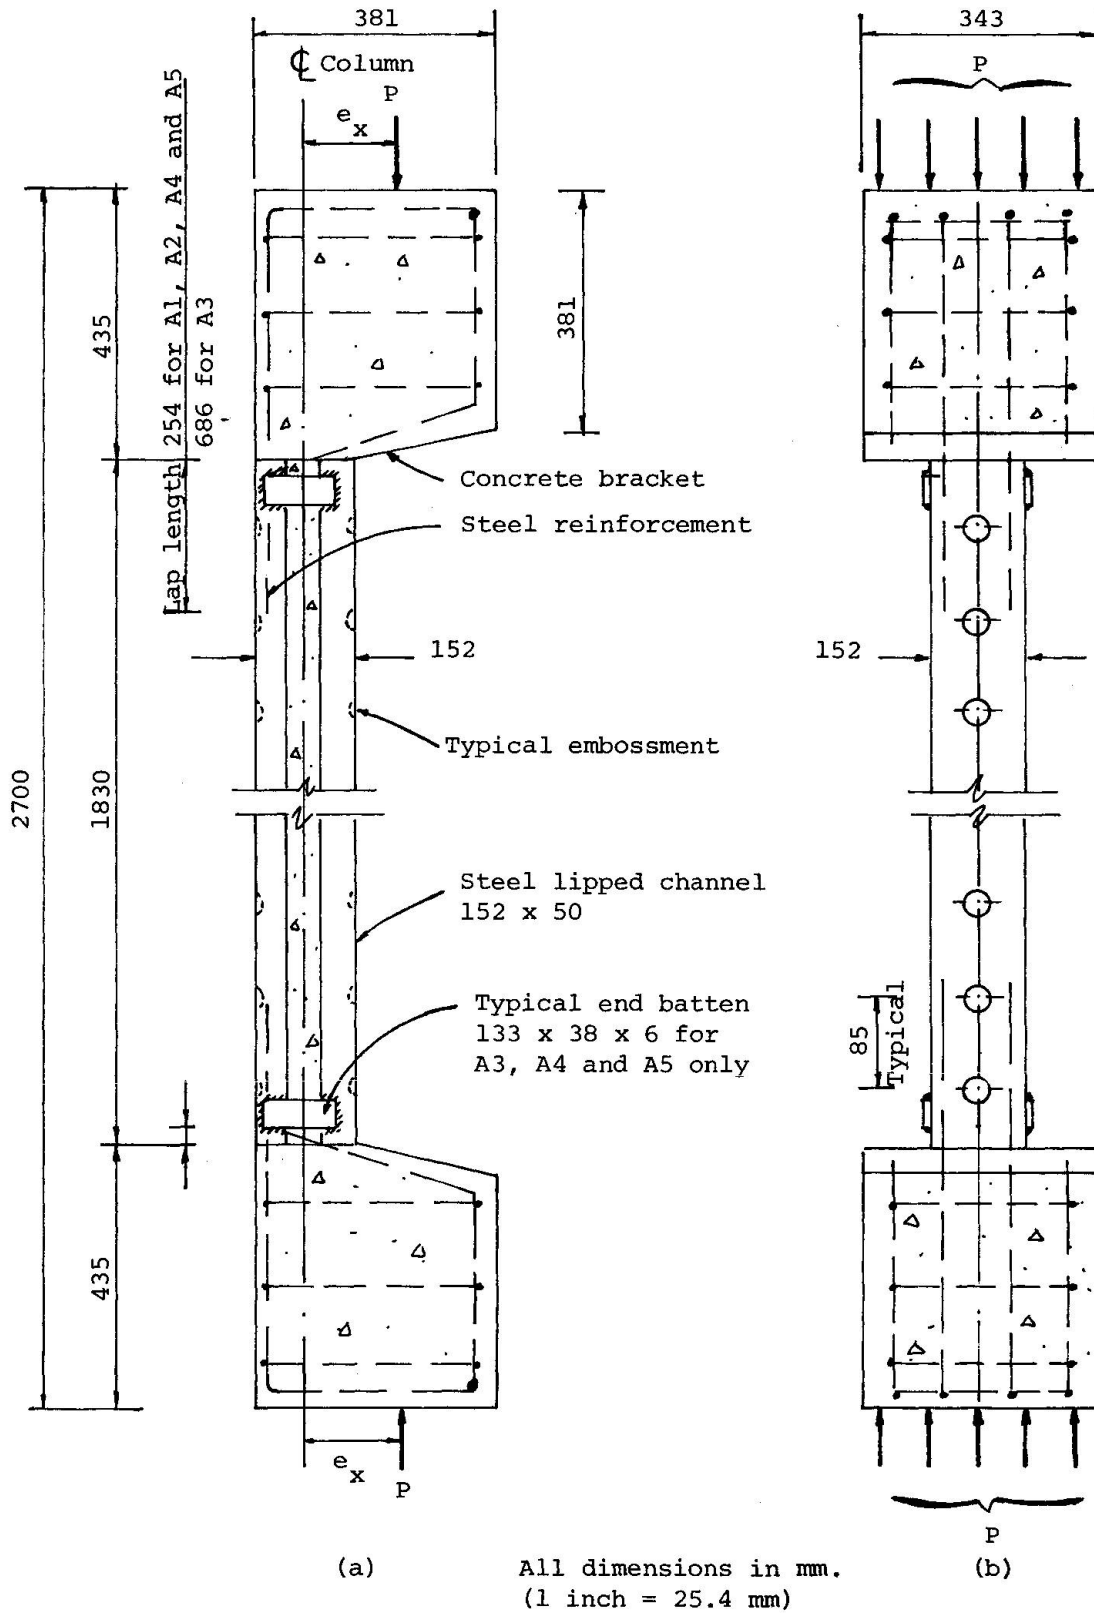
Typical Eccentrically Loaded Column (Group A)
